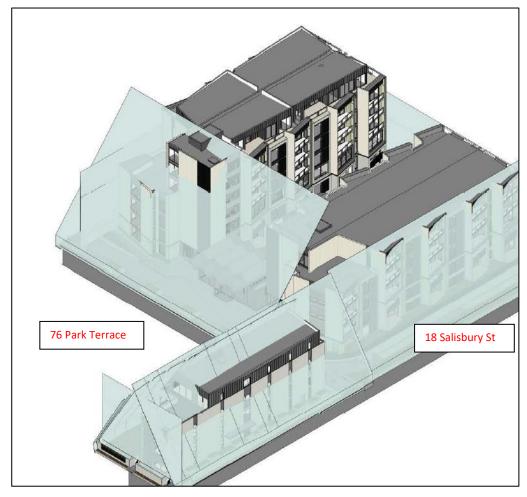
View looking northwest showing extent of the breach of the recession plan on the southern and eastern sides of Building 7.
